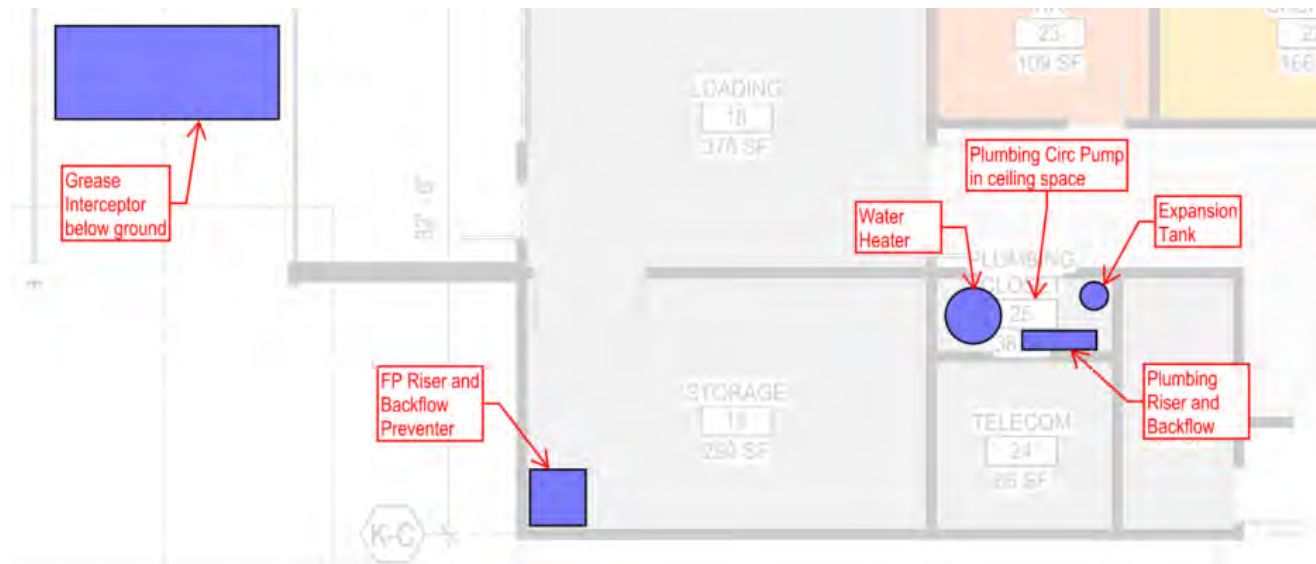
LODGE BUILDING PLUMBING EQUIPMENT
